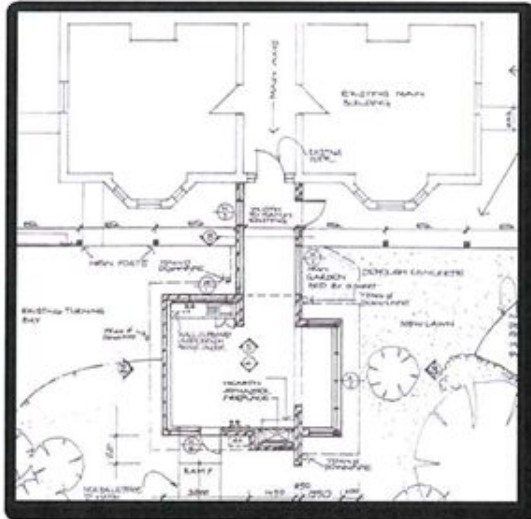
Sitting Room addition plan, 1990, showing retained entry
